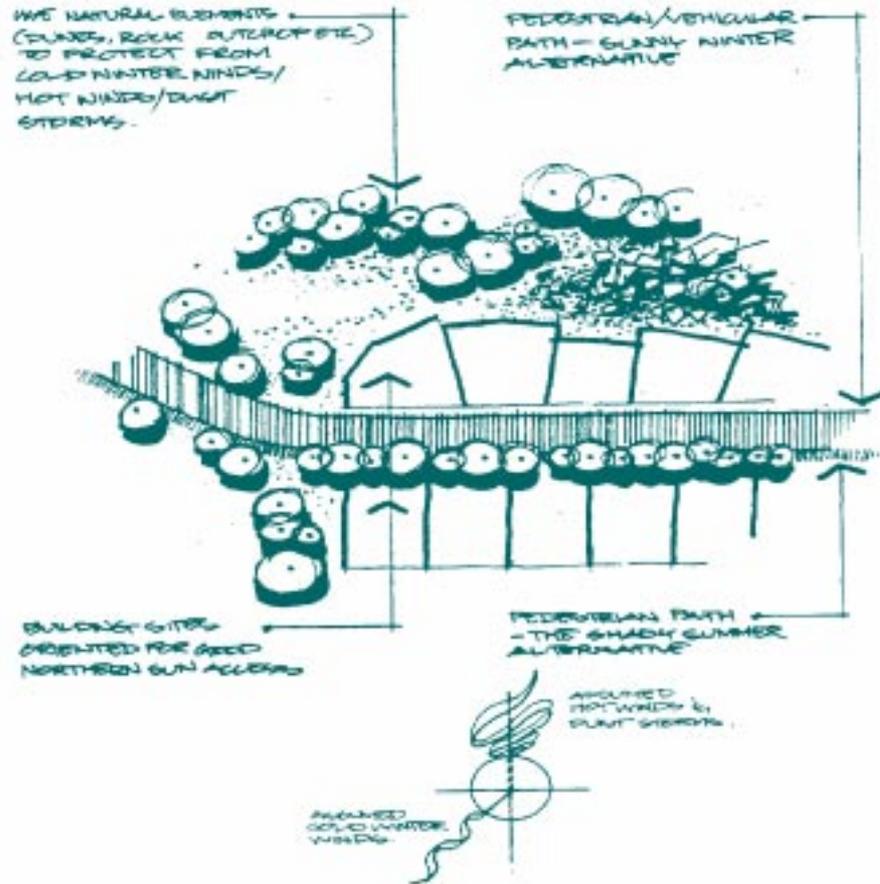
Allotment layout and site planning considerations for the Hot Arid Zone.
